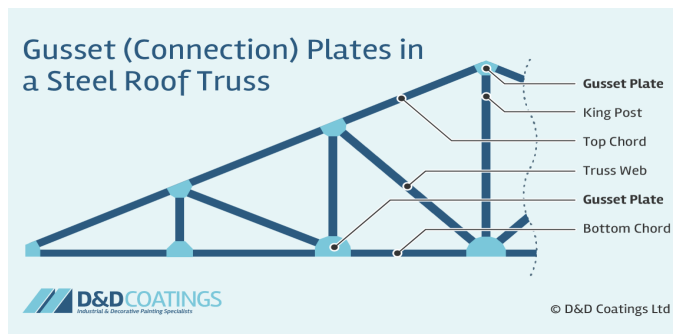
Gusset Plate Connection (D&D Coatings, 2019)
